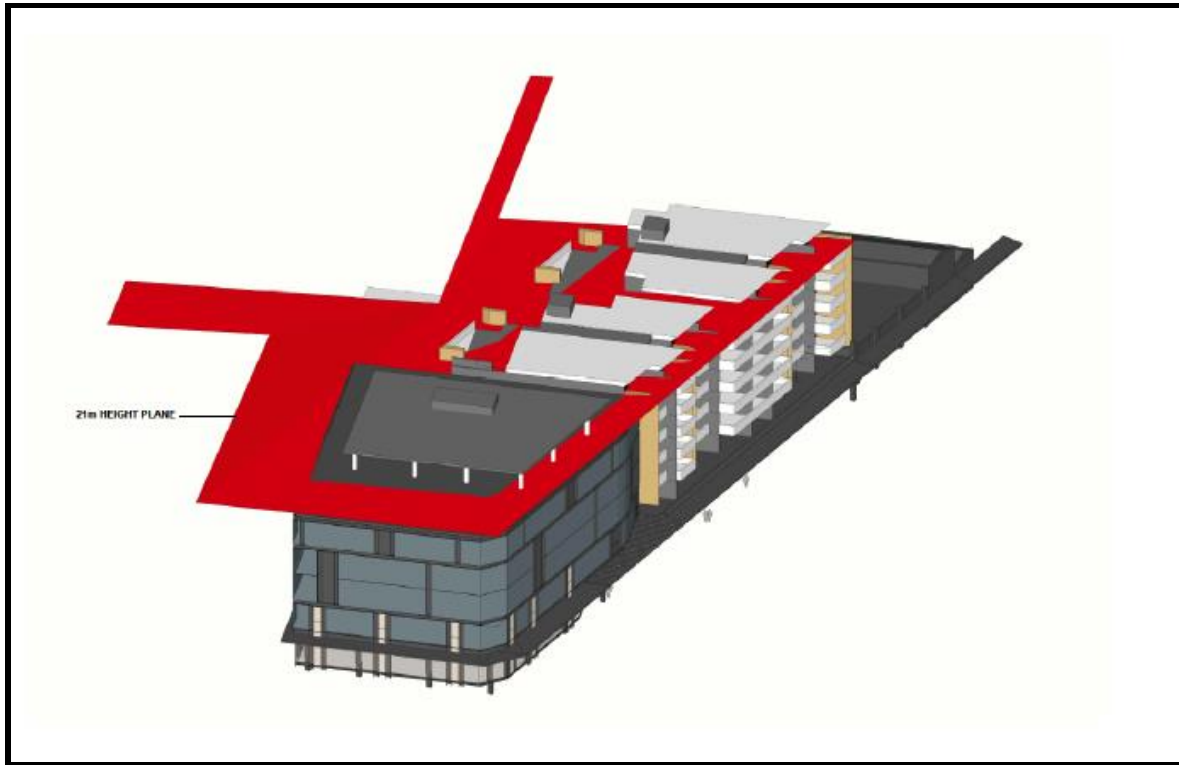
Building height plane exceedance (Source: Revised Clause 4.6 prepared by Rod Logan Planning, undated)
